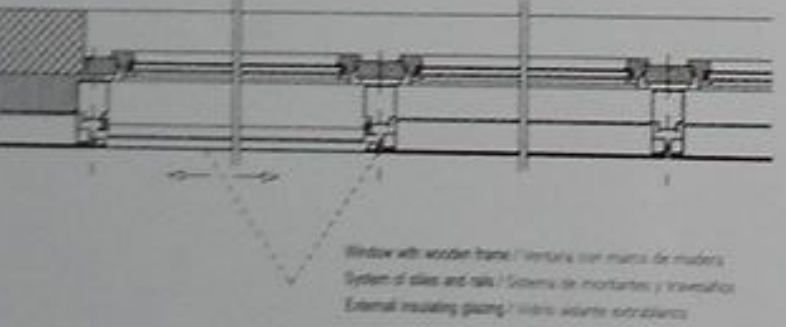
Detail A: Folding curtain for window with wooden frame / Detalle A: Cortina plegable para ventana con marco de madera
